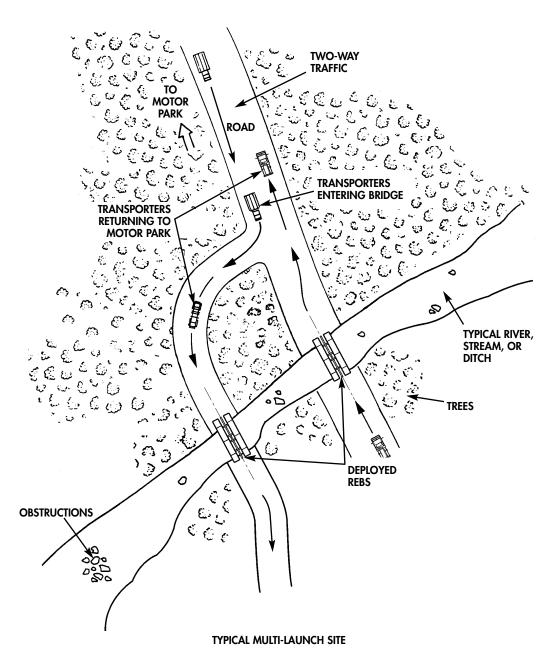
Bridge Assembly Site Layout for Multi-Launch Site.
